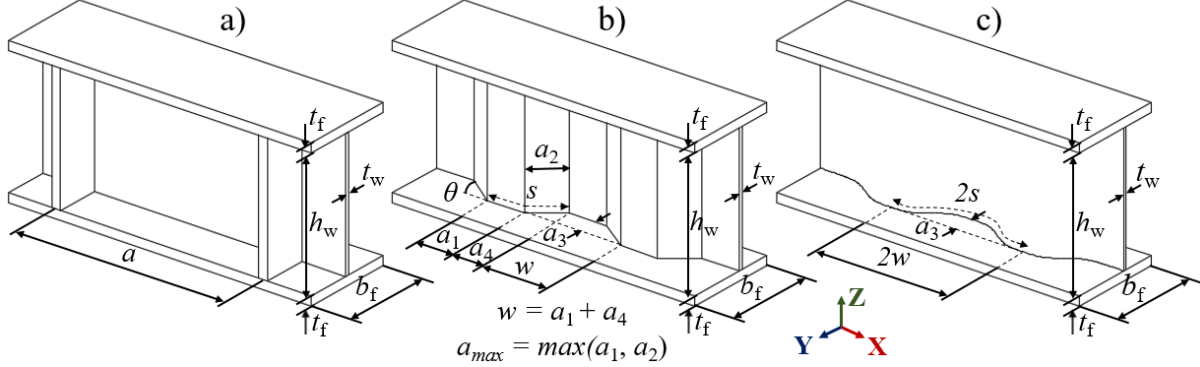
Geometric notations of typical a) conventional I-girders, b) trapezoidal and c) sinusoidal corrugated web girders.
